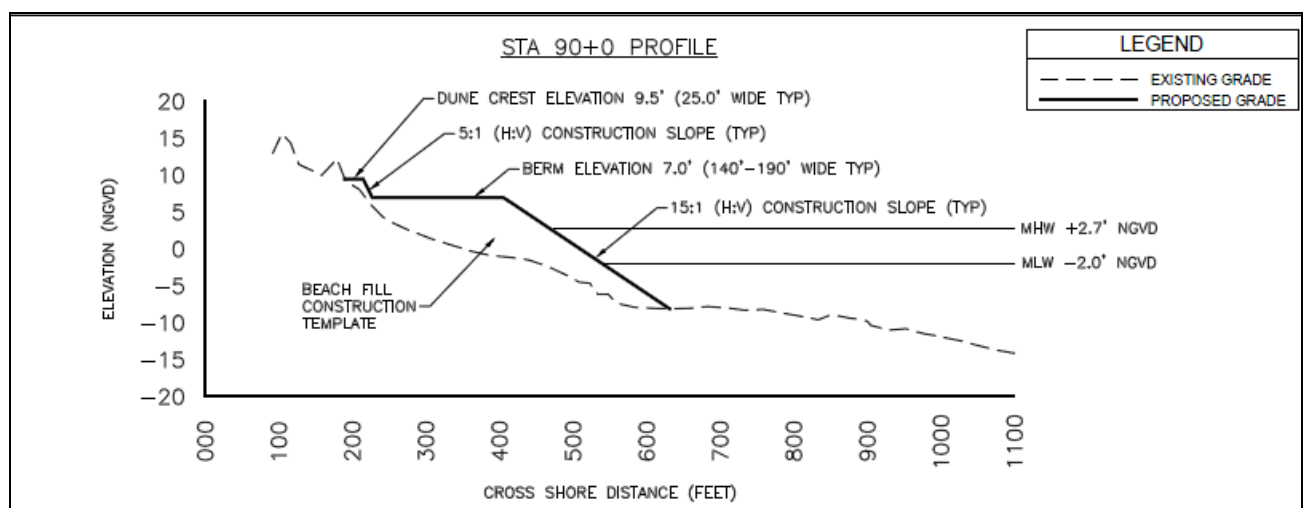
Central Reach Nourishment Typical Cross-Section
